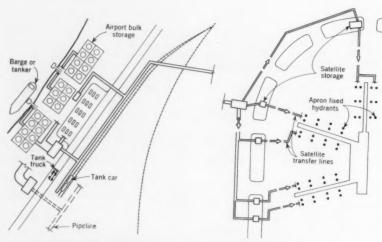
Modernization of the fueling system at many airports will include the installation of an underground fixed hydrant system to replace some or all refueling trucks. Piping will connect airport fuel storage tanks with flush hyrant installations at apron fueling positions.
